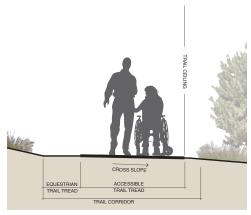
Backcountry Trail Layout, Section, and Allowed Users
